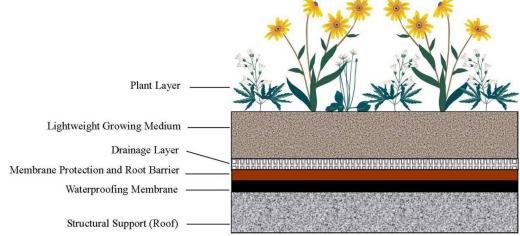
Green Roof Cross Section Source: Virginia Stormwater Management Handbook
